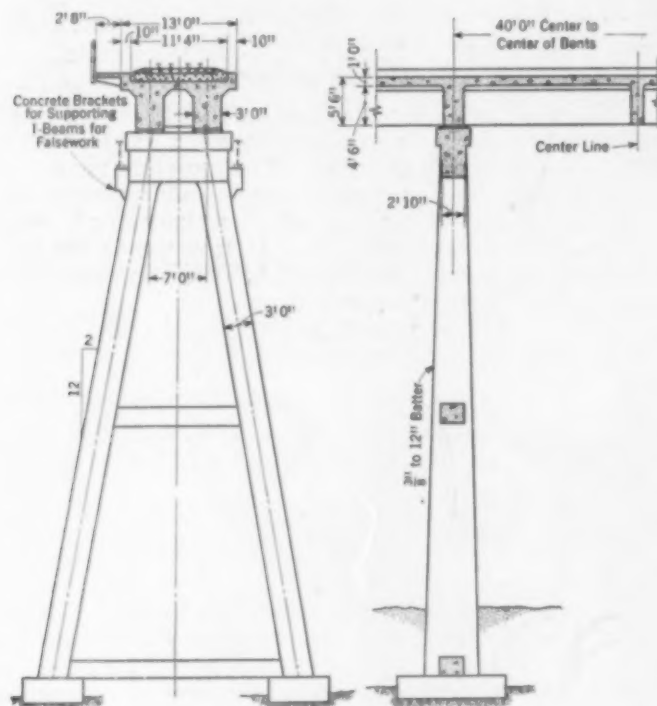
TYPICAL TRANSVERSE AND LONGITUDINAL SECTIONS,
